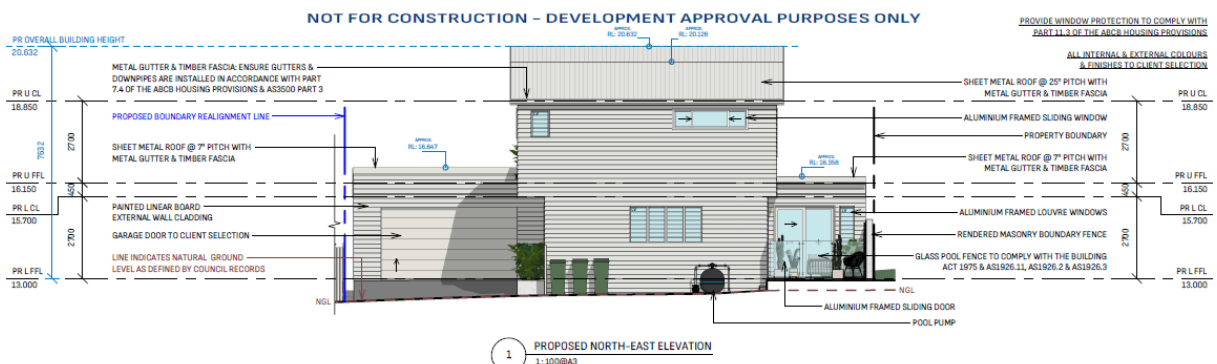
Proposed North-east Elevation (Proposed New Dwelling)
